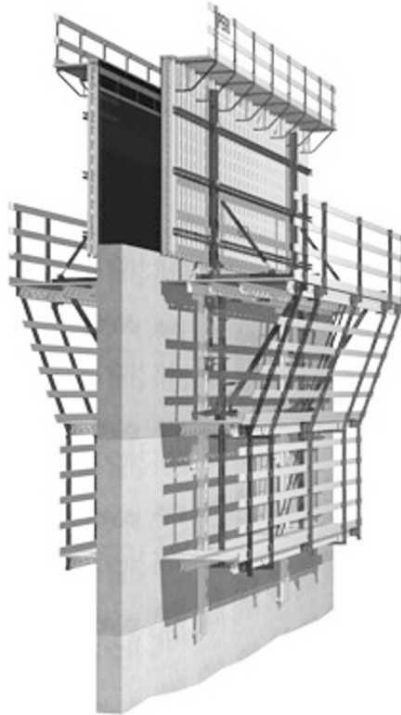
ACS R Formwork System (Courtesy PERI).
